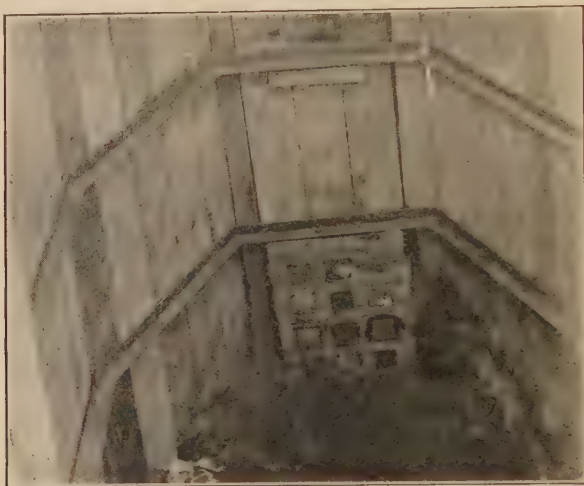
Angle iron brace for excavating manhole in sandy soil.
